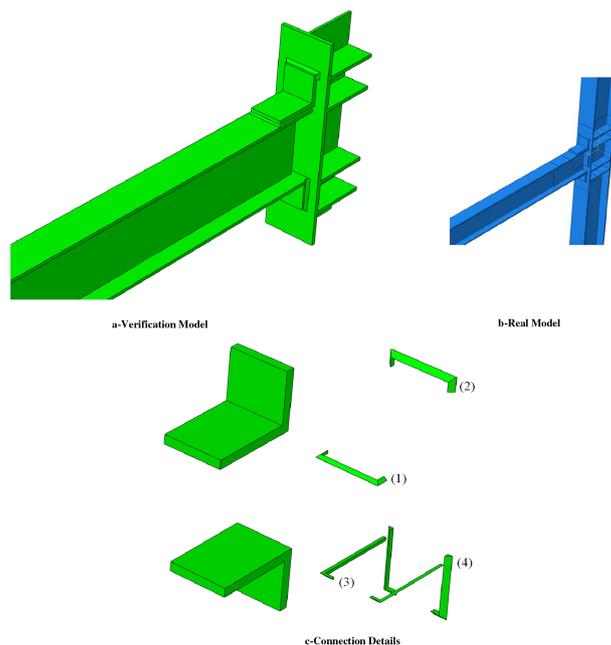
Finite element model of the connection. (a) Verification model. (B) Real model. (C) Connection details.
